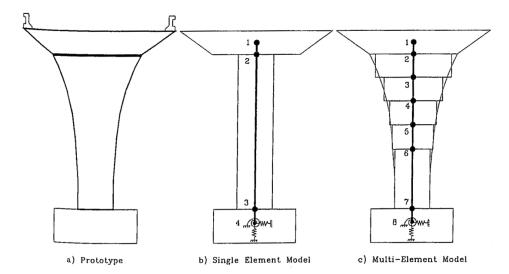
Single-Column Bent Models (Priestley et al, 1996)
